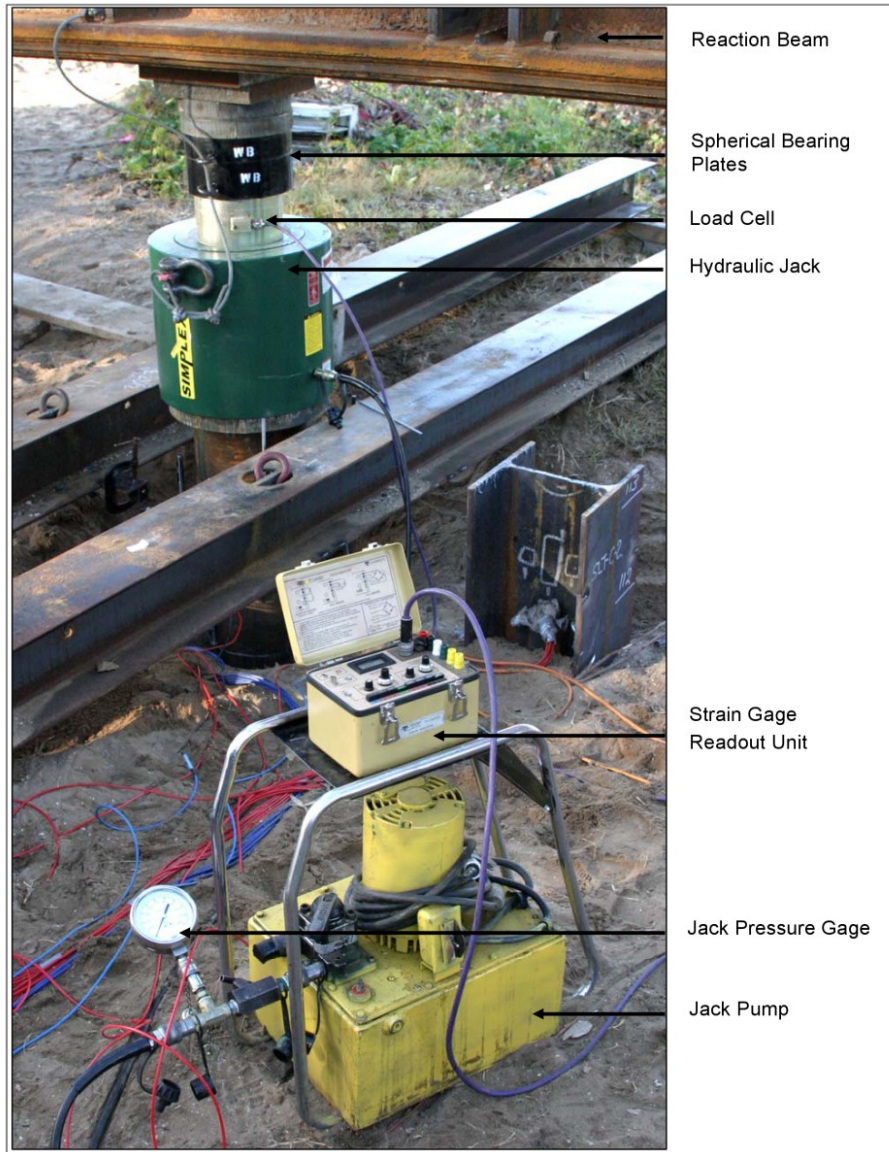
Load test load application and monitoring components (FHWA, 2006a).
